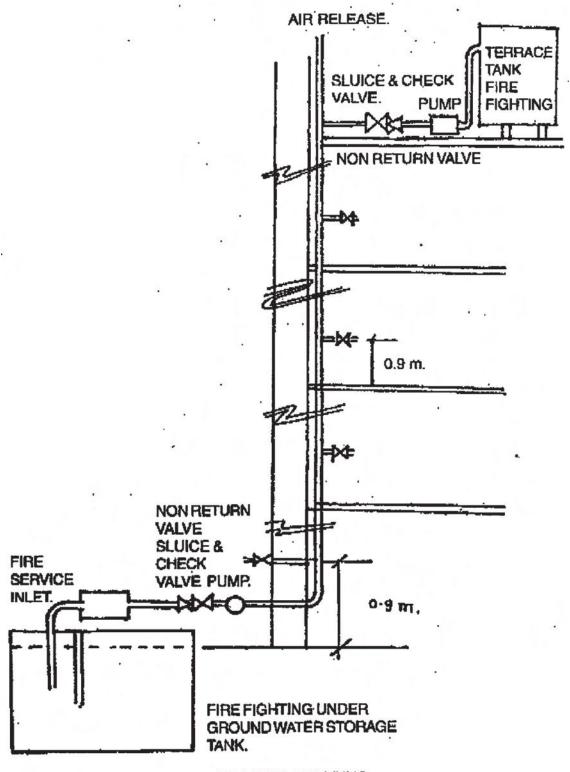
APARTMENT BUILDING EXCEEDING 16 m.
